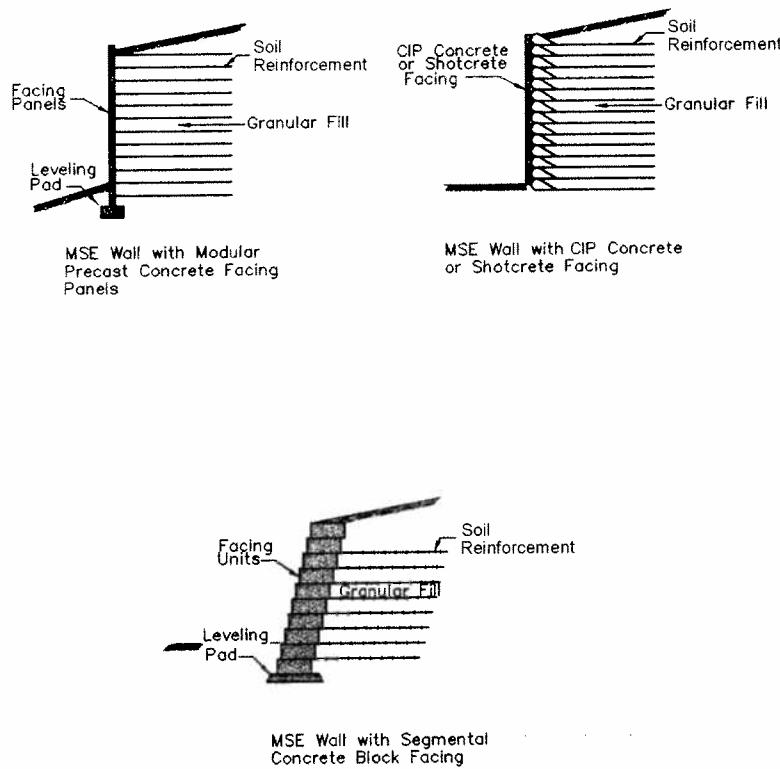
Typical Mechanically Stabilized Earth Walls.
